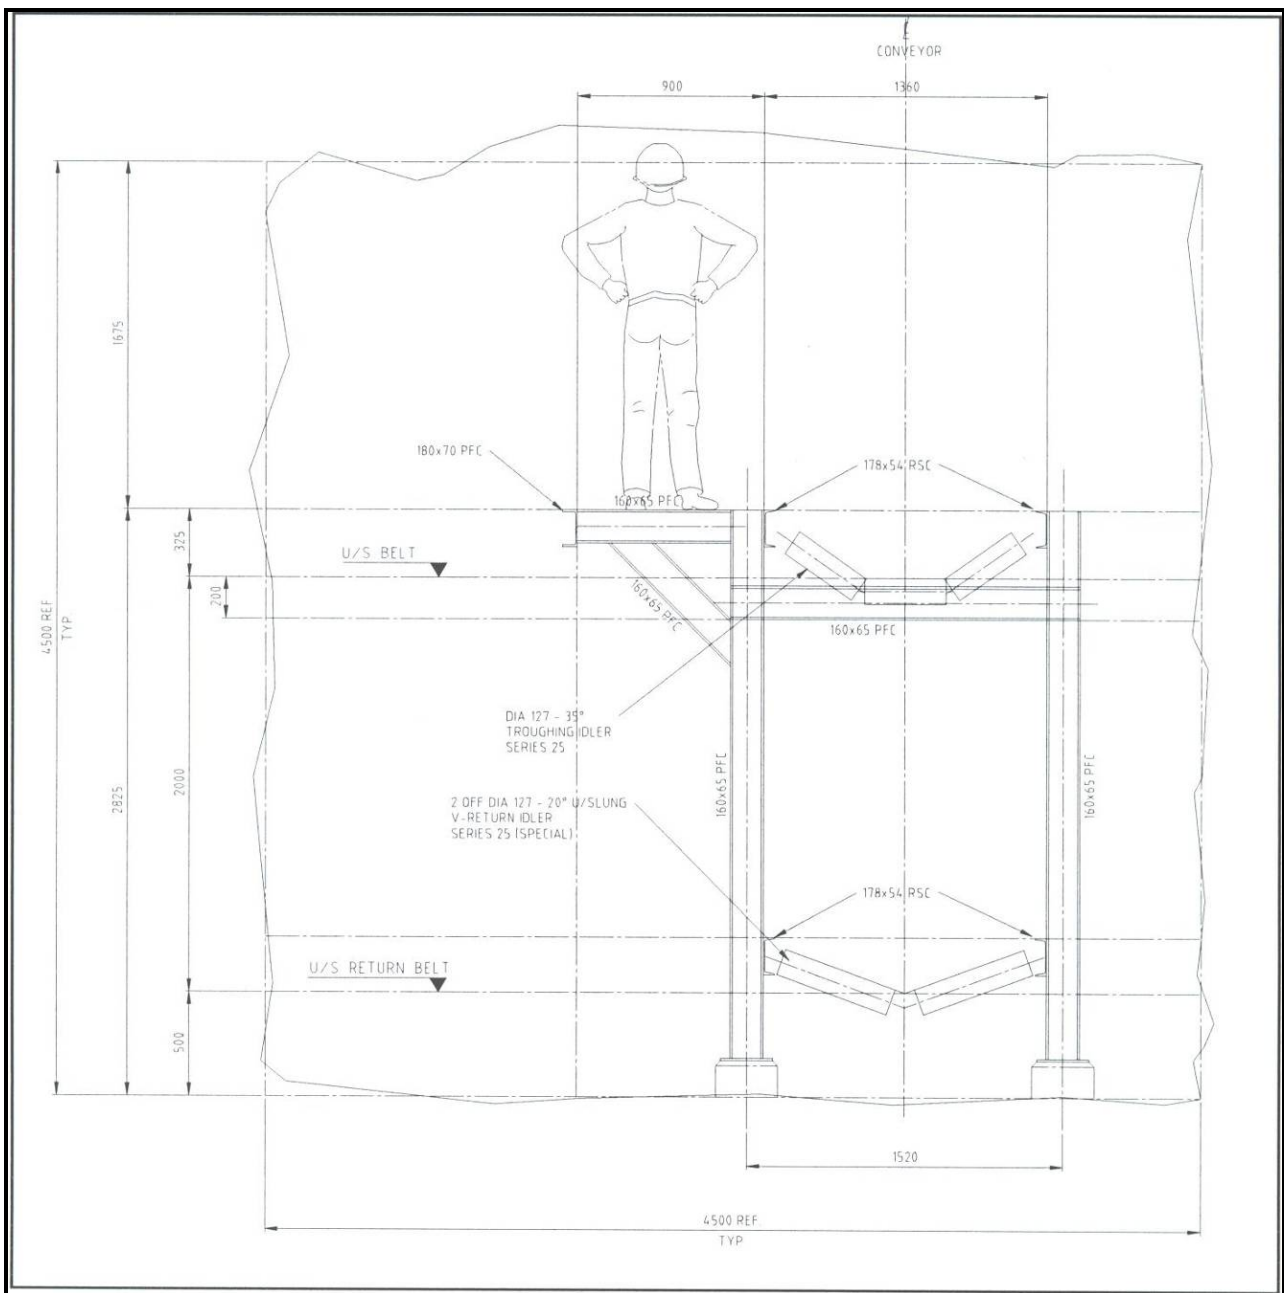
Getting off the Belt (going out the mine) – Section through Platform (Top Belt – Existing)
